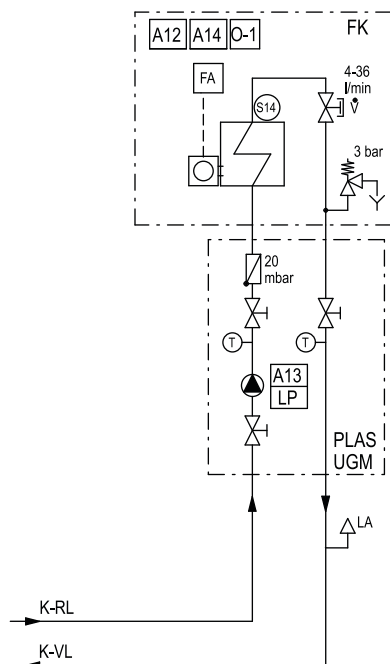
SolvisBen Solo with three mixed heating circuits, solar system and third-party boiler – part 2
